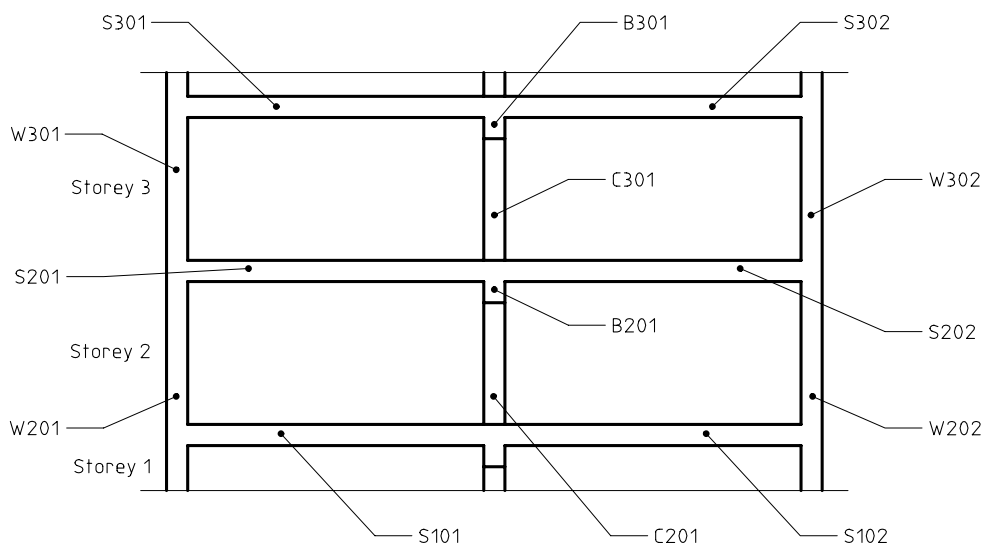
Example of designating columns, slabs, walls and beams in the second storey
